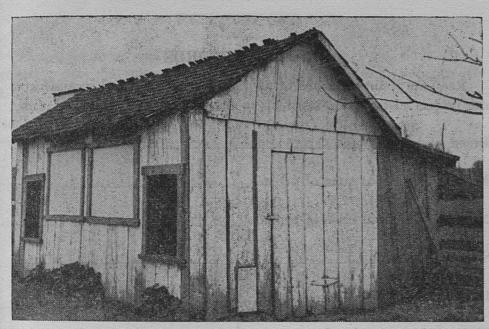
The same house shown in Fig. 4, after remodeling. Means for ventilation and sunlight have been provided in front, and 5 feet more depth has been added.
